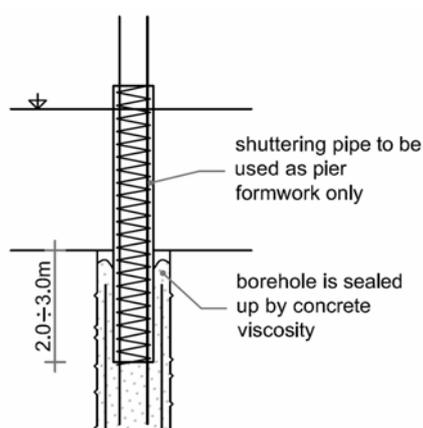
Execution of underwater joint by means of a shuttering pipe
